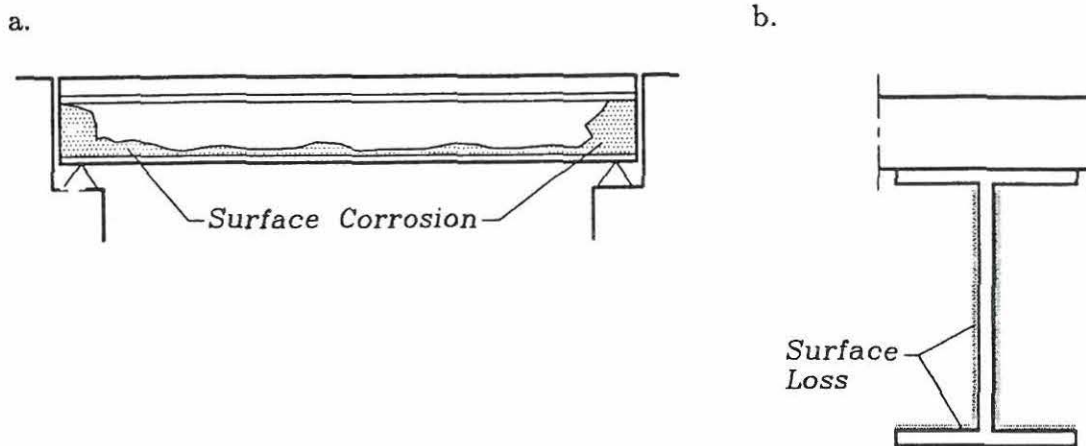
Corrosion of a steel girder (Kayser, 1988).
